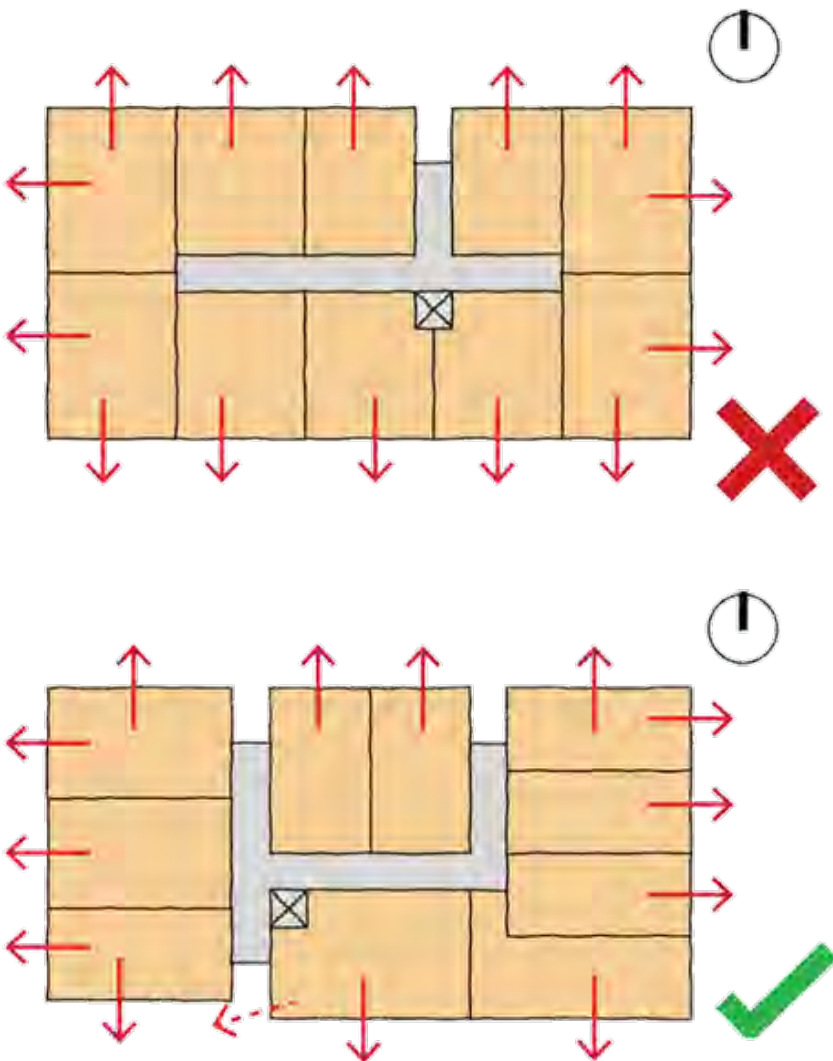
Configure internal apartment layouts and modulate external facades to reduce the total number of south-facing units to enable deeper sunlight penetration.
